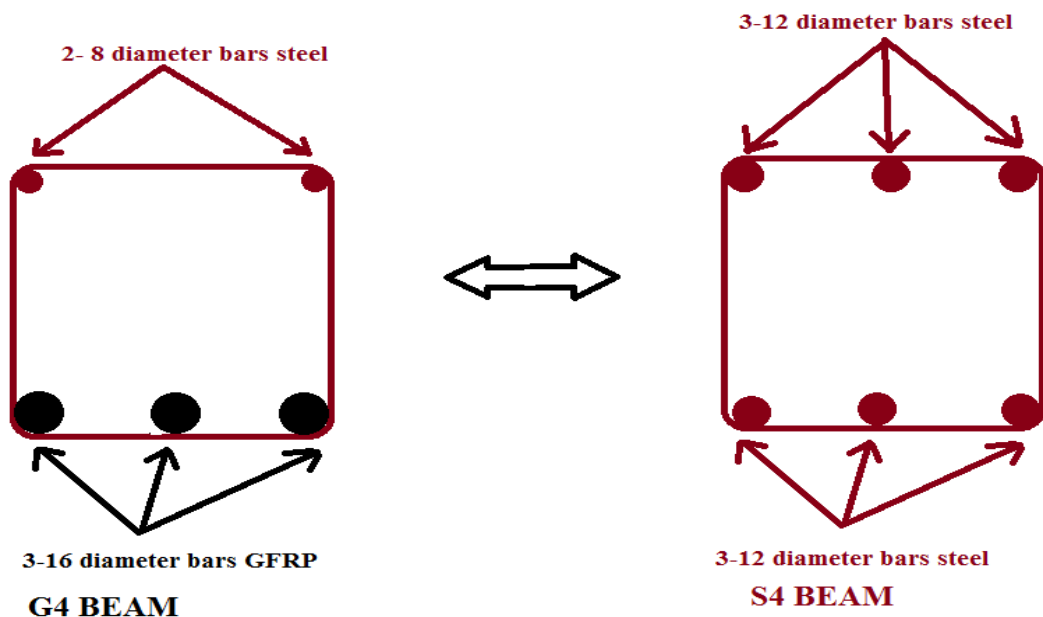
Sketch representing reinforcement placement of S4 and G4 beam
